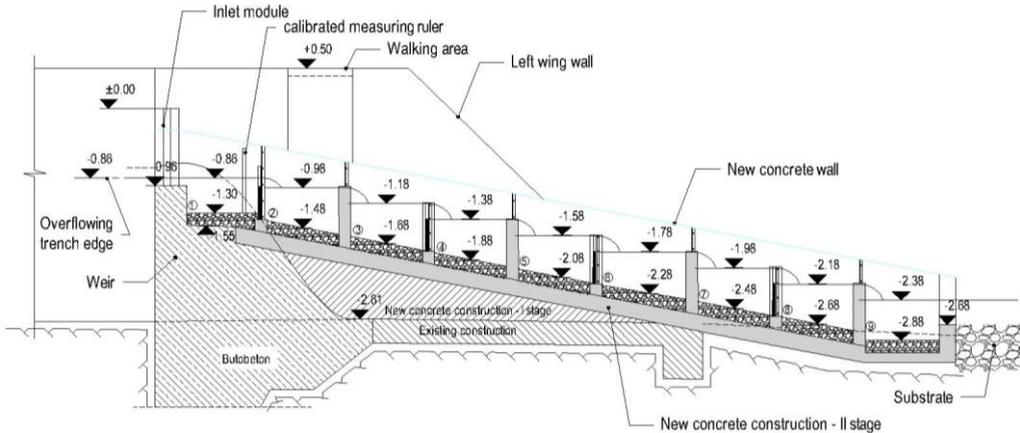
Pool pass with surface notches at the walls between the pools – longitudinal section
